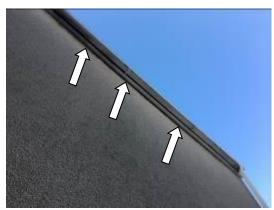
Showing the fascia board at the top of the walls on Building C – gaps occur in places, predominantly on the eastern aspect.
